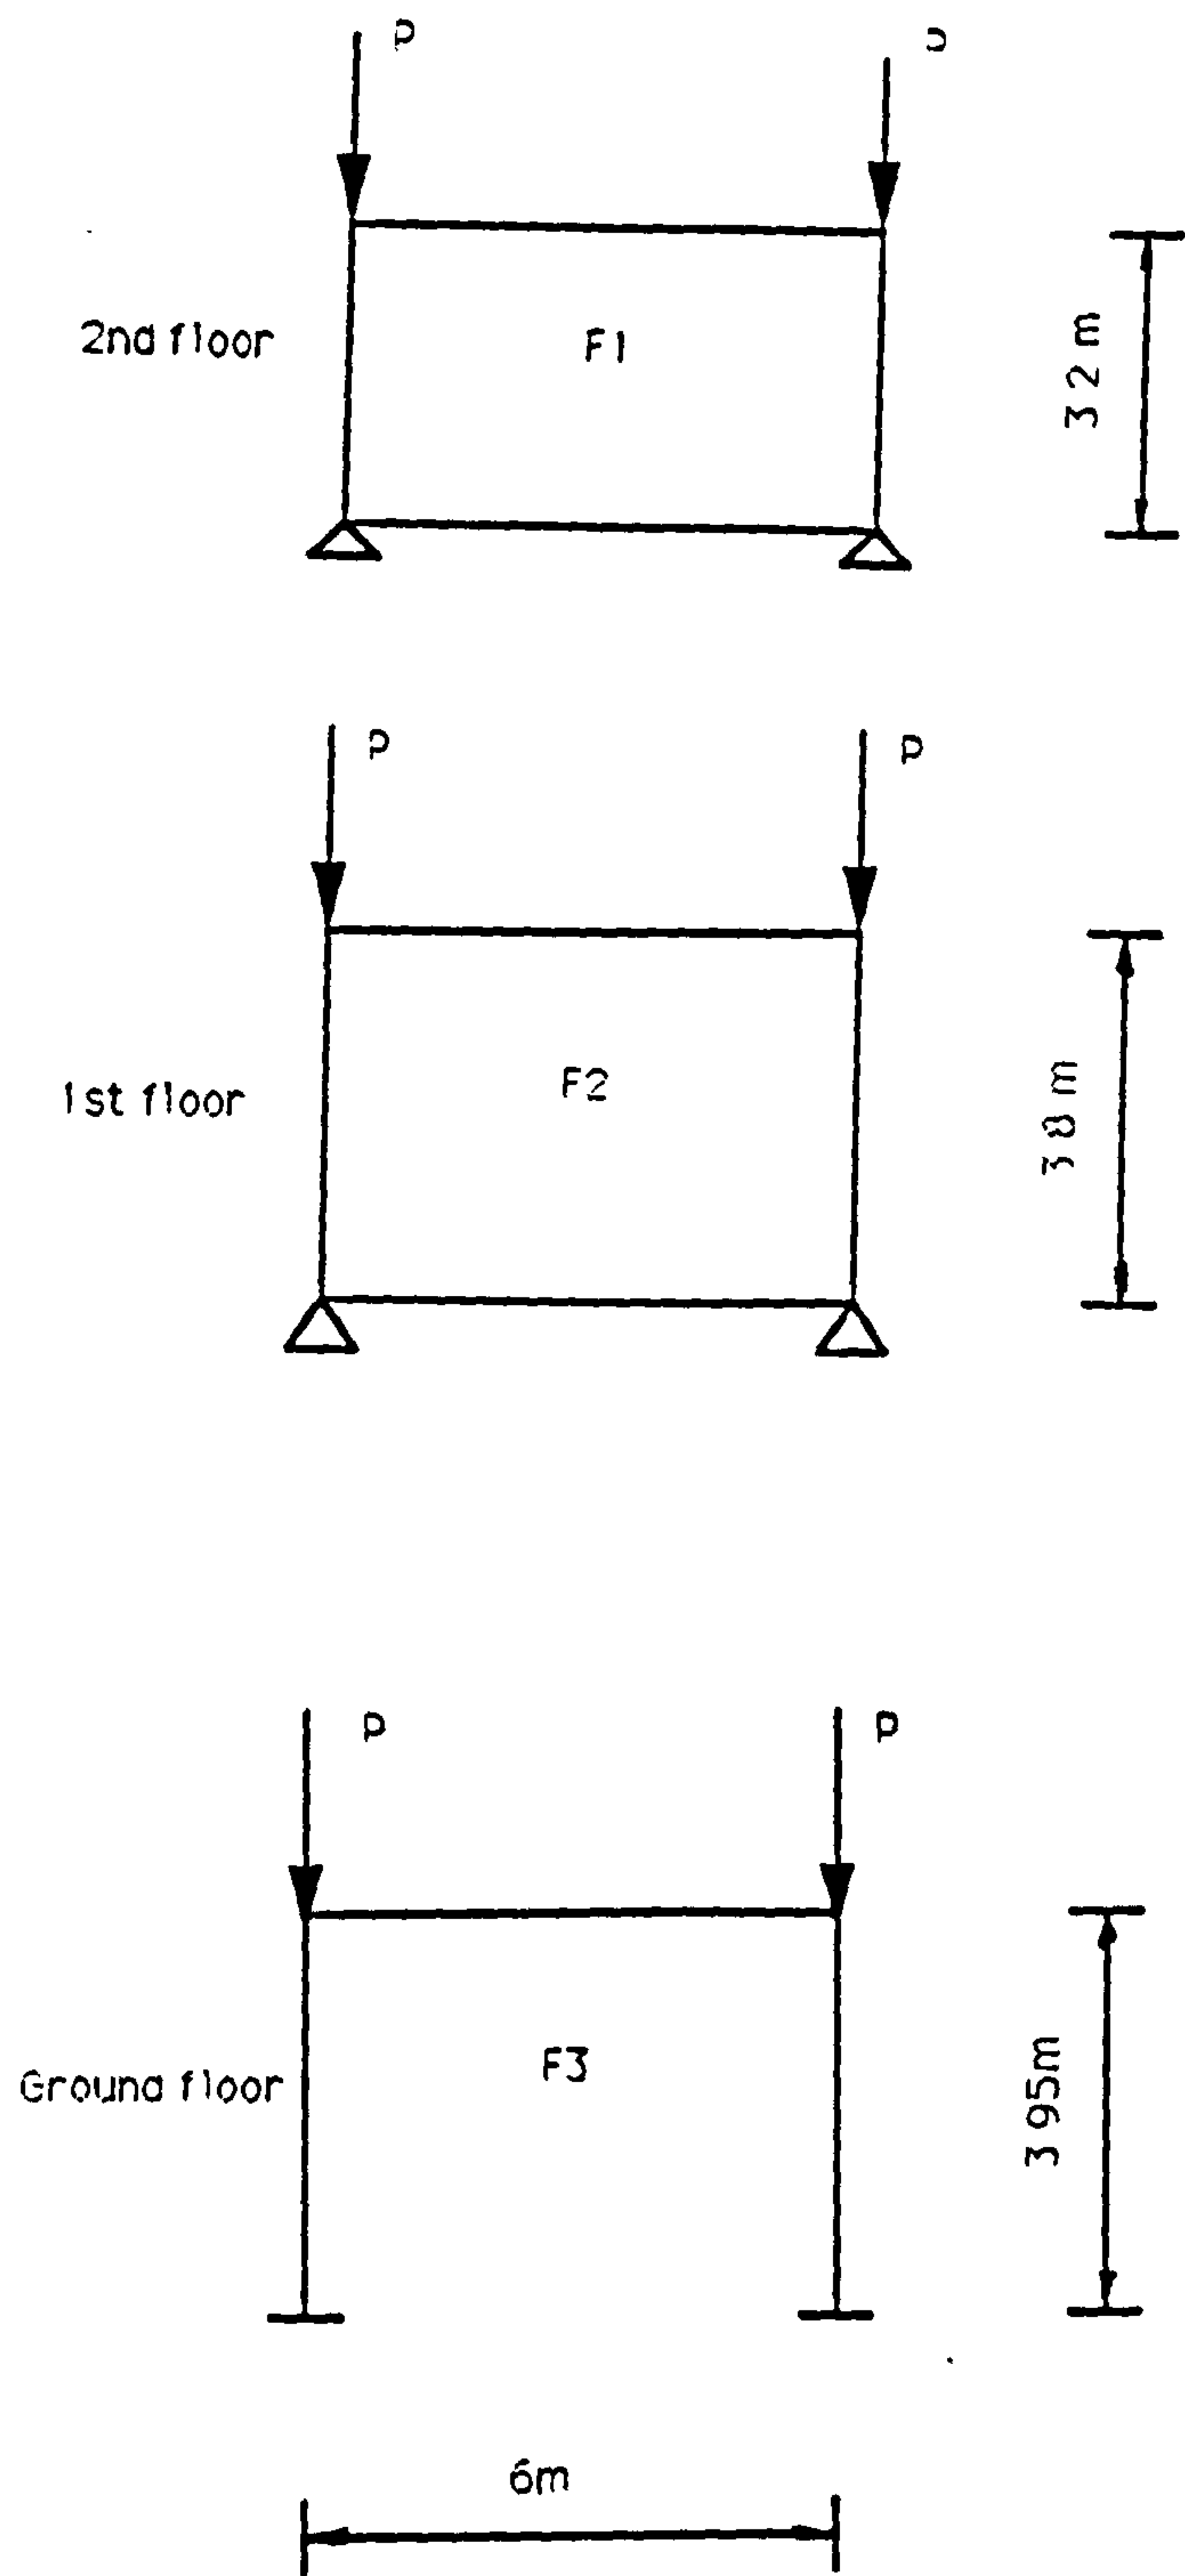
Sub-frames considered for 2nd, 1st and ground floor
